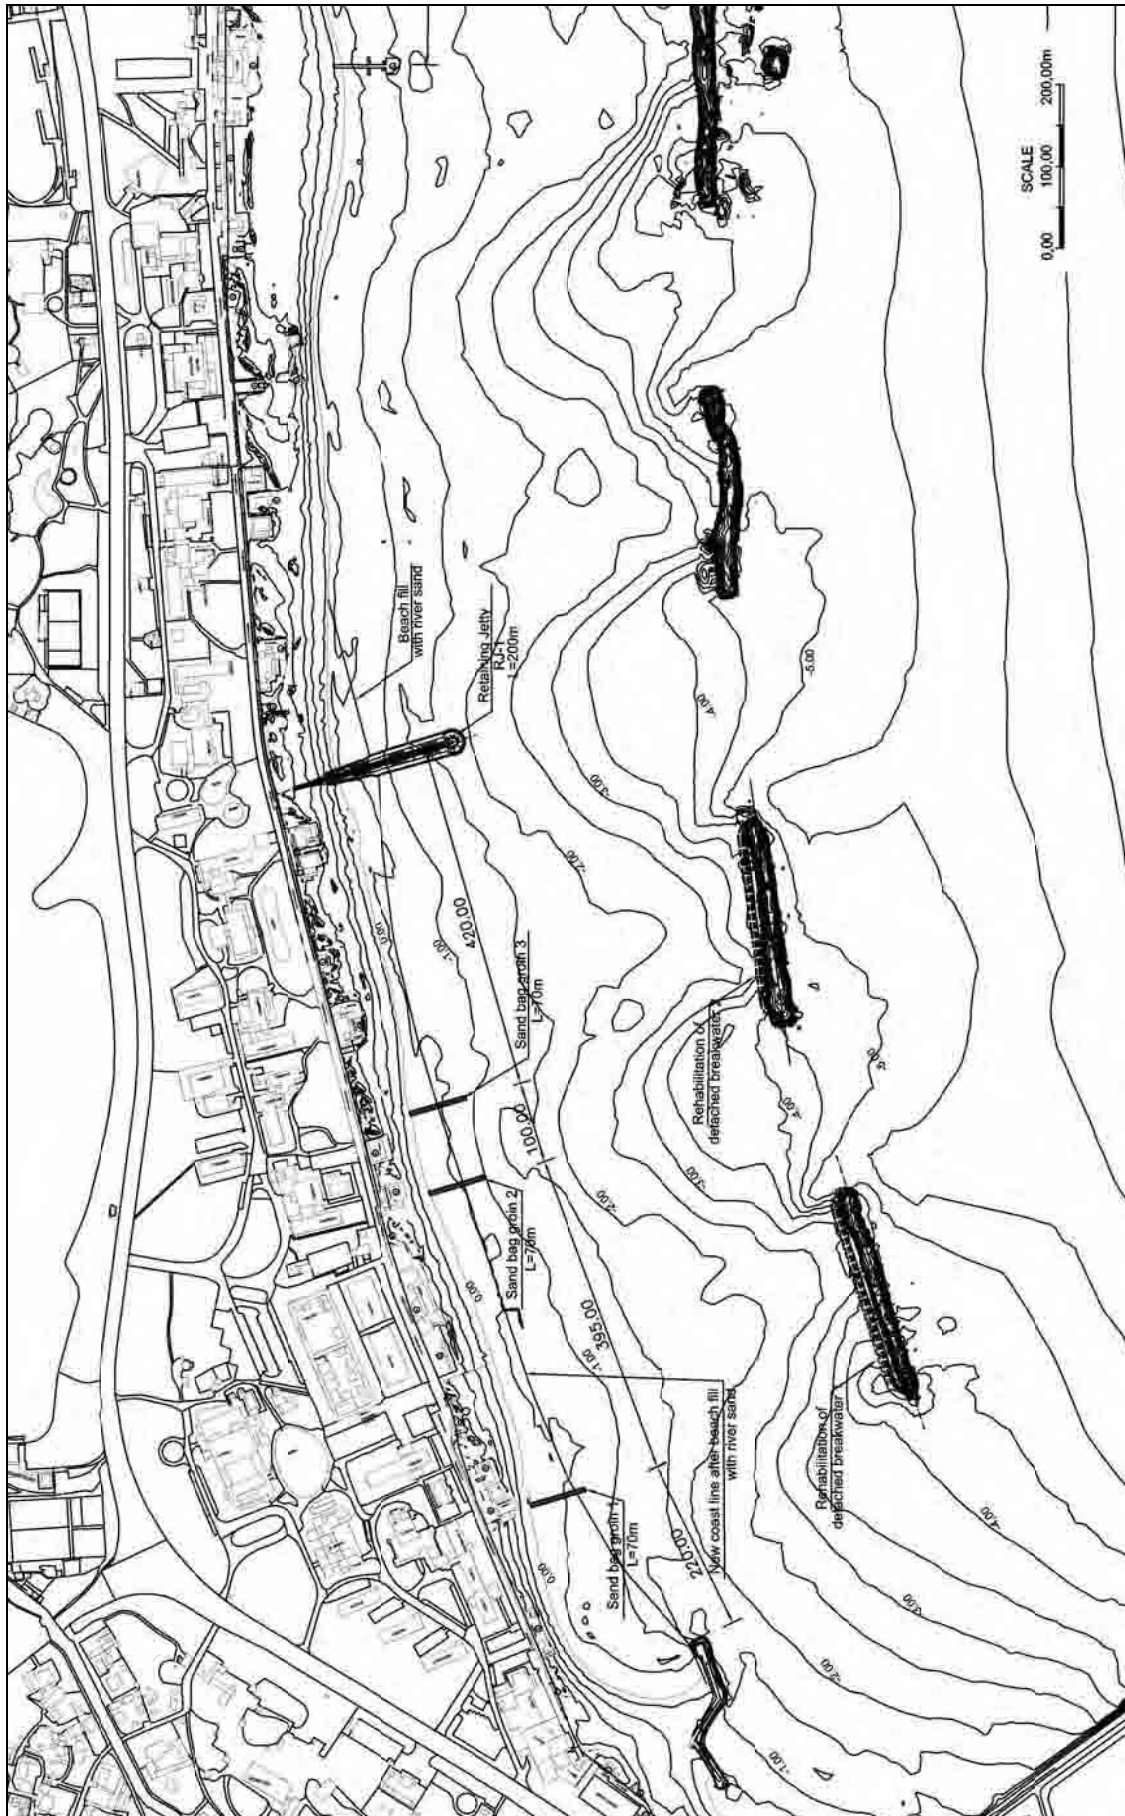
(1): General layout of shore protection facilities at Mamaia Sud with river sand (southern part)
